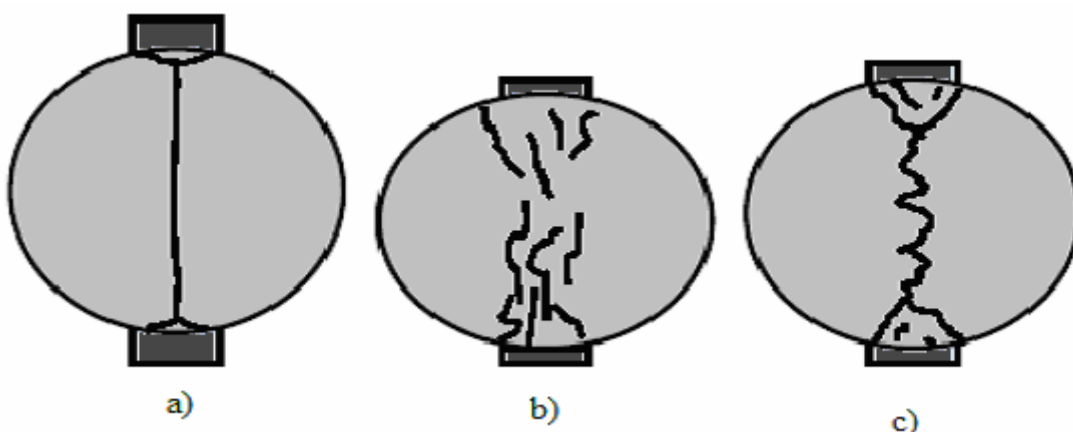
Failure type for asphalt concrete specimen from indirect tensile strength
